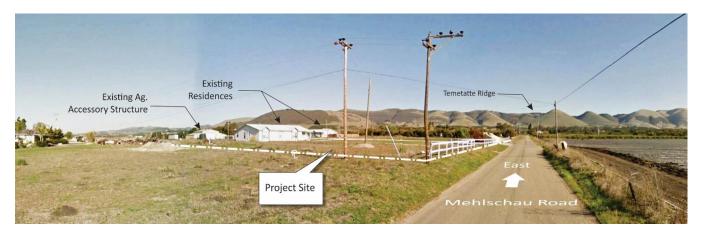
View of the Project Site Looking East on Mehlschau Road
